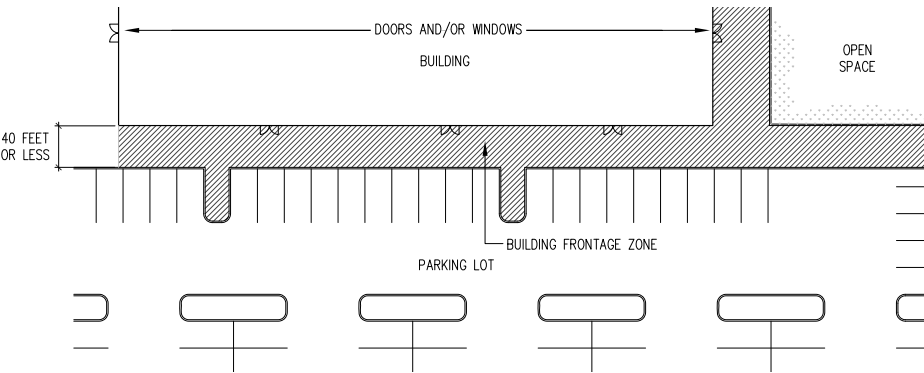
DRIVE AISLE WITHIN BUILDING FRONTAGE ZONE
